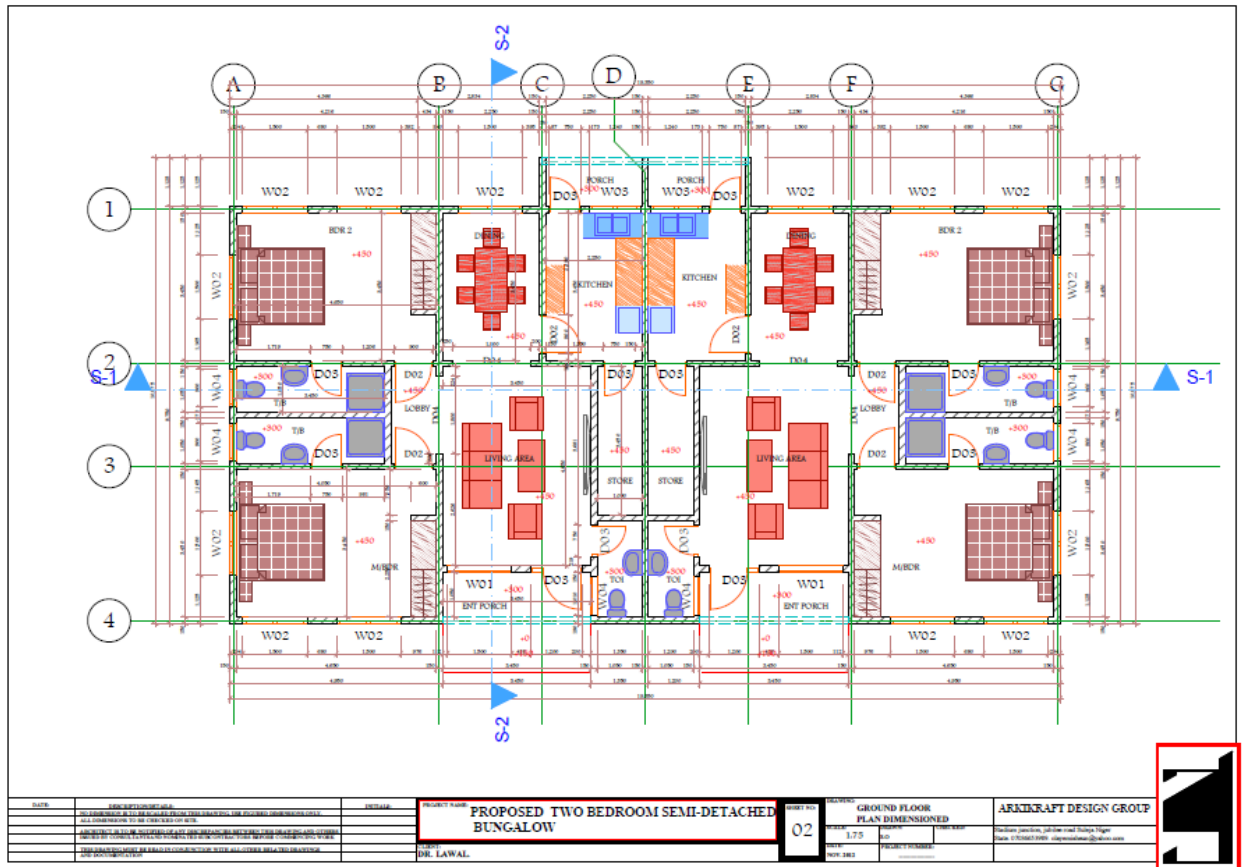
Floor Plan of Twin 2-Bedroom Semi-detached Bungalow
